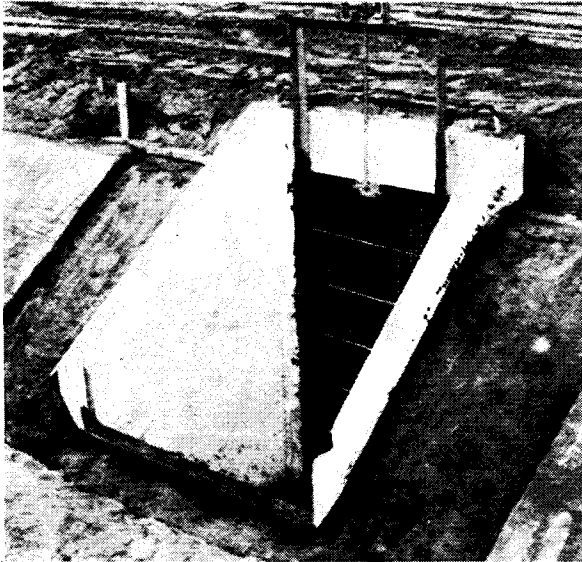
Precast turnout inlet in place in canal bank. Note concrete lining blocked out around structure. PX 303-429 NA
